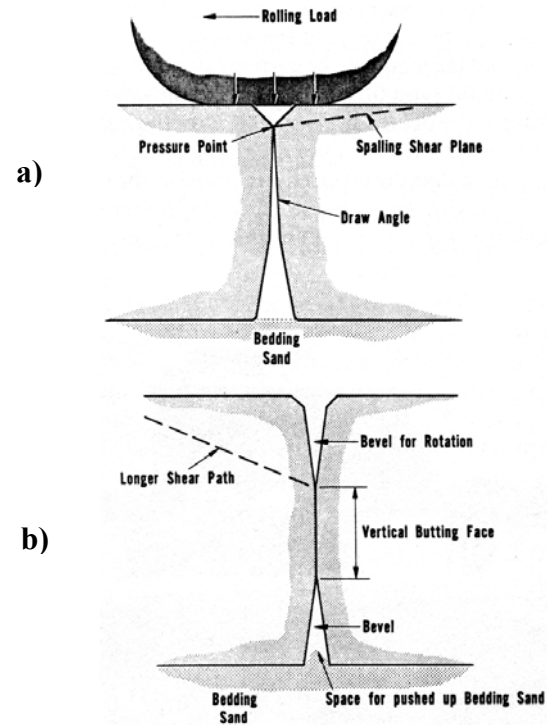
Inverted V-shaped edge detail for raft units (Ref 16)
